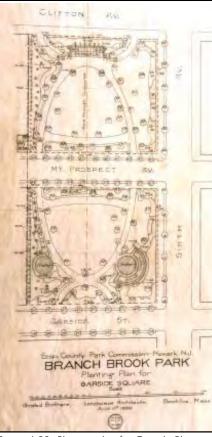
Planting plan for Garside Place, Plan #2121-273, sheet 1. 2 September 1899. Source: ONHS.
